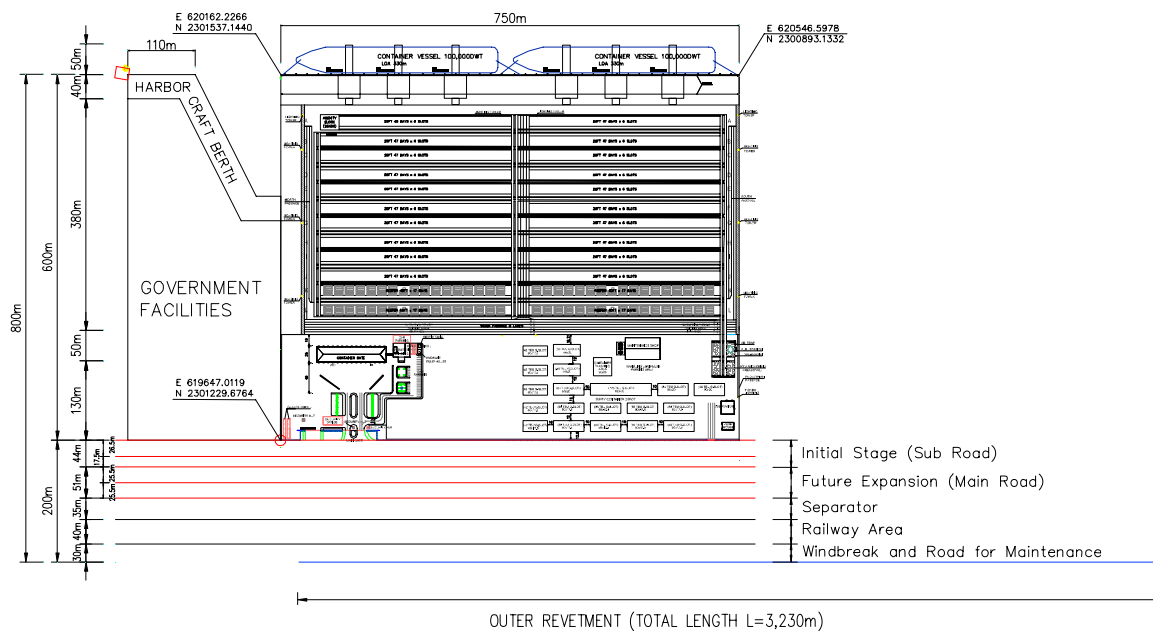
General Layout of Road and Railway behind Terminal
